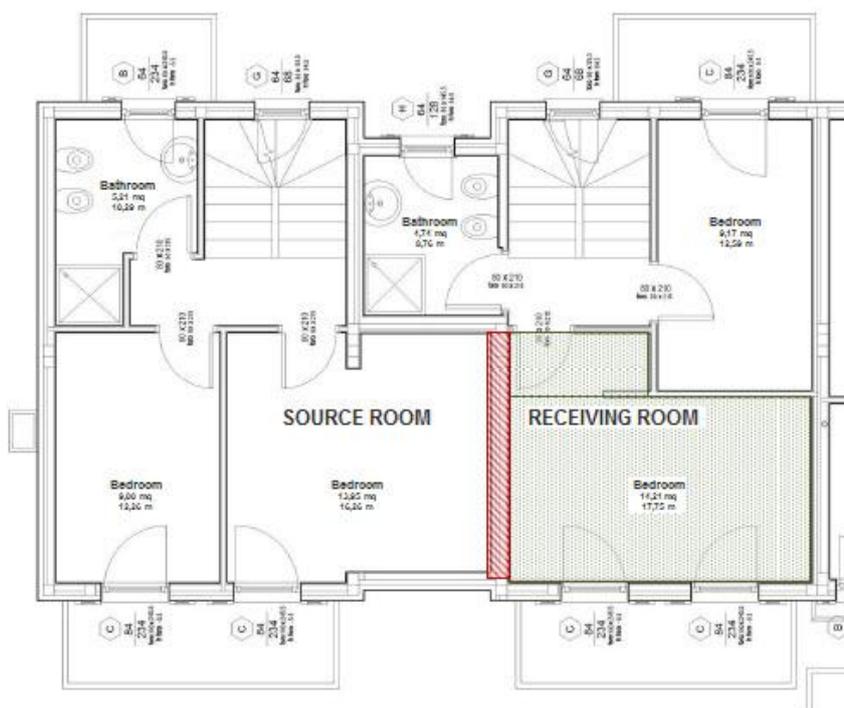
Second floor: red = inner wall under test, grey = floor under test.
